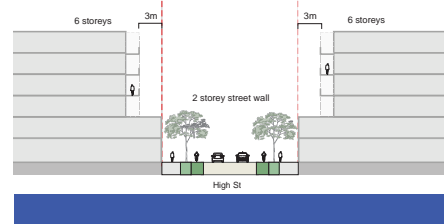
High Street, High Street North Precinct. A two-storey street wall height is proposed, consistent with the existing character.
